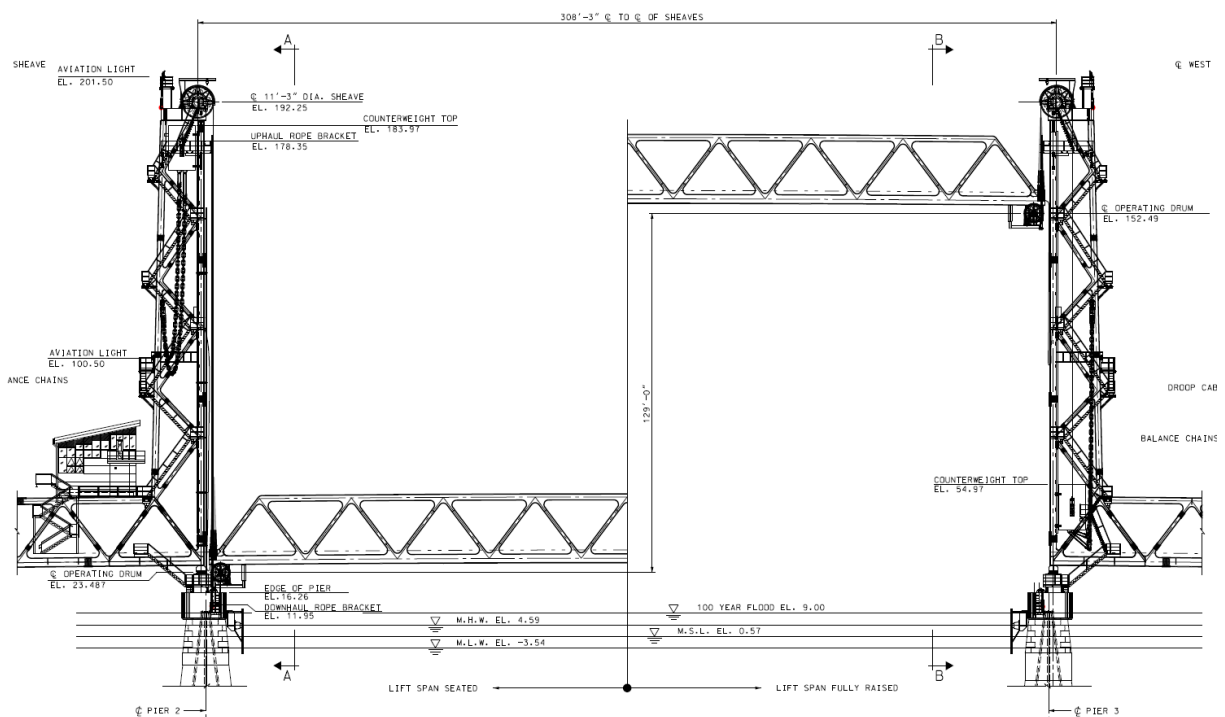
Elevation of the vertical lift span in its lifted and un-lifted states
